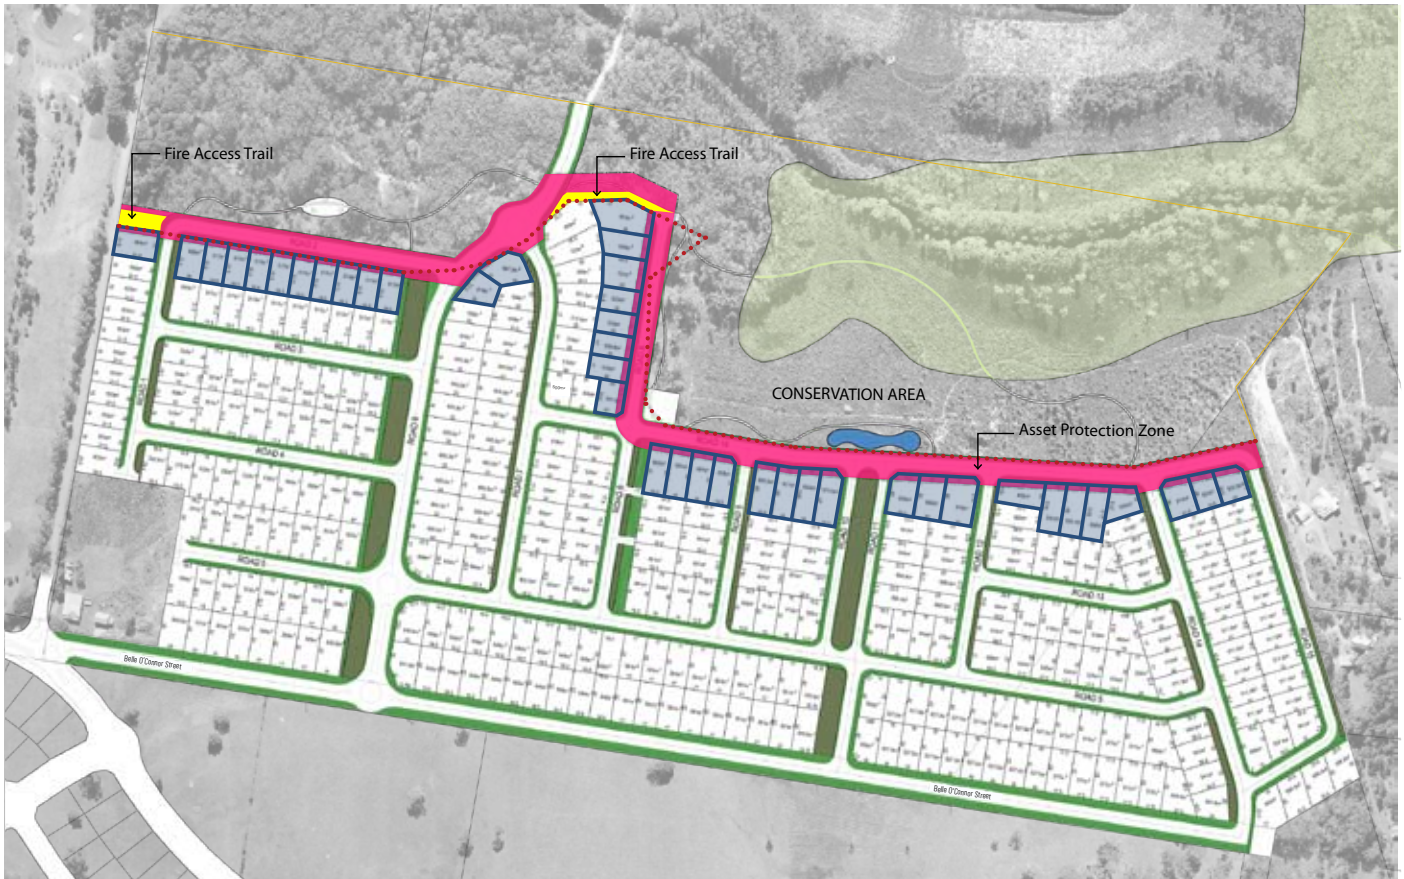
BUSHFIRE CONSTRAINTS PLAN
